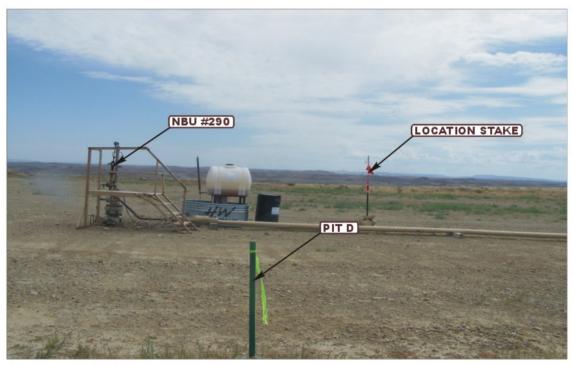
PHOTO: VIEW FROM PIT D TO LOCATION STAKE
